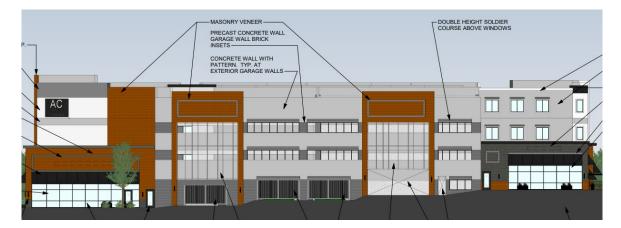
View of parking garage façade from Elmridge Street, showing garage entrance and proposed metal swing doors for trash enclosure.
